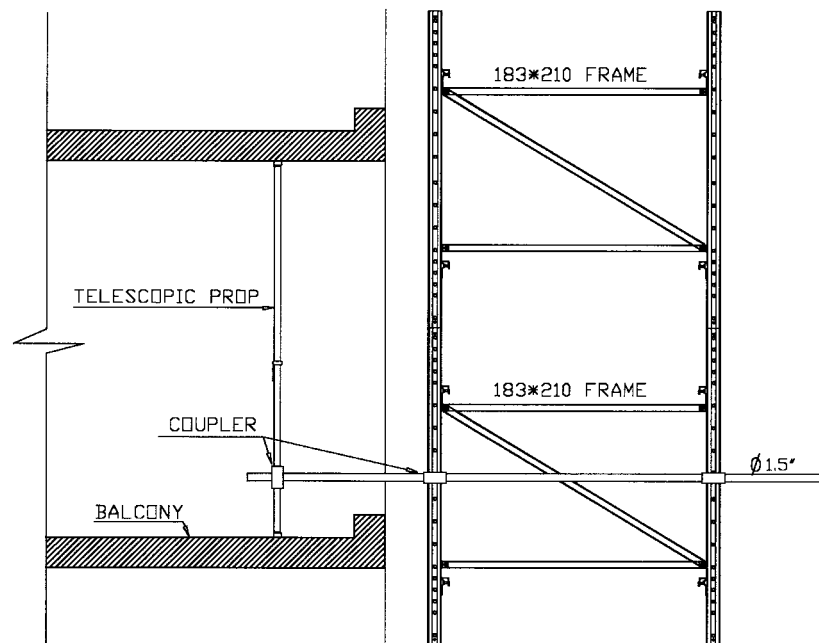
Detail of Shoring Tower Tied to Building (Frame Sizes in cm)
